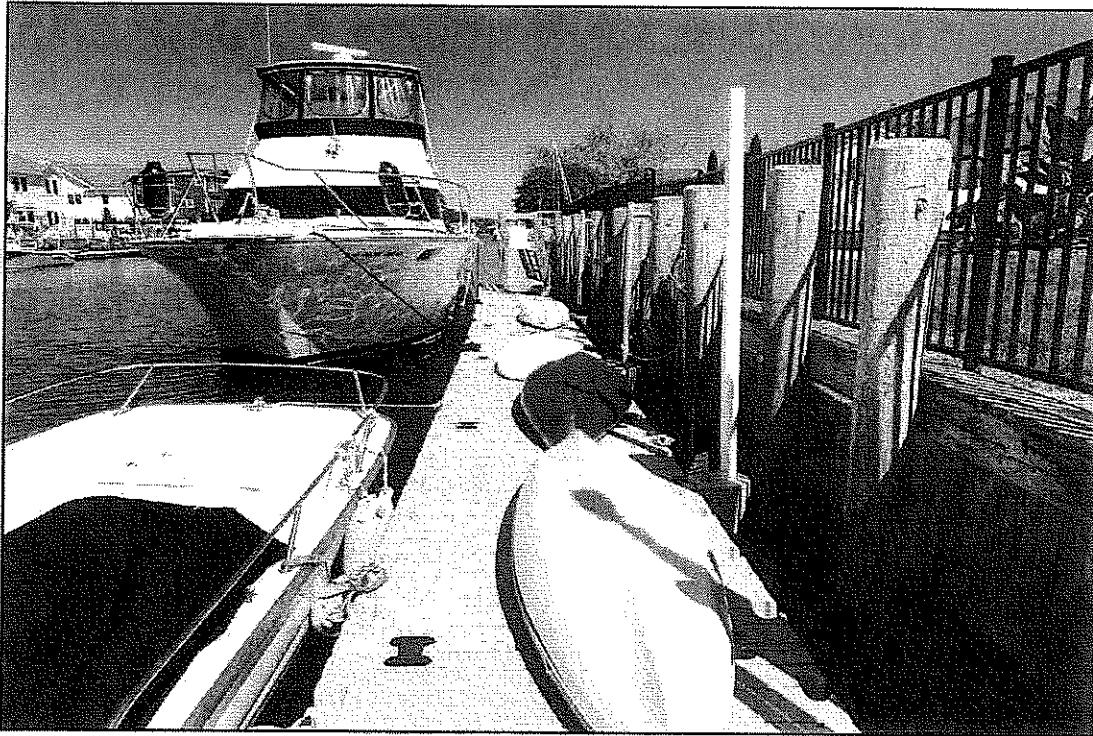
Existing timber bulkhead, vinyl floating dock, and timber gangway, looking north.
